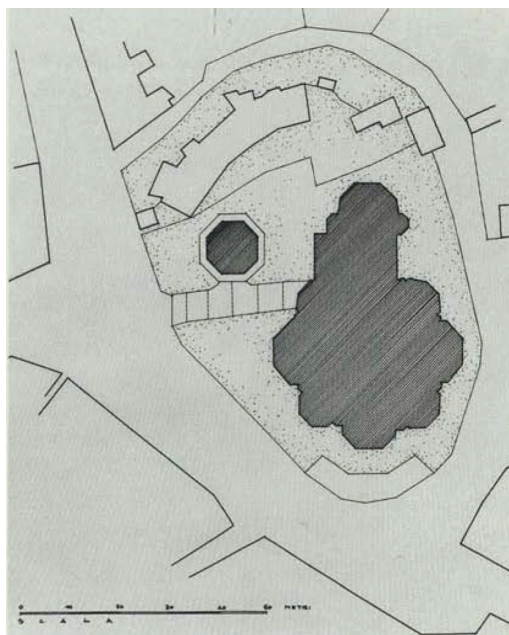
P. Zanini, Floor plan of Mortegliano Cathedral with the design of the new bell tower. Zanini Archive, Civici Musei, Udine.
